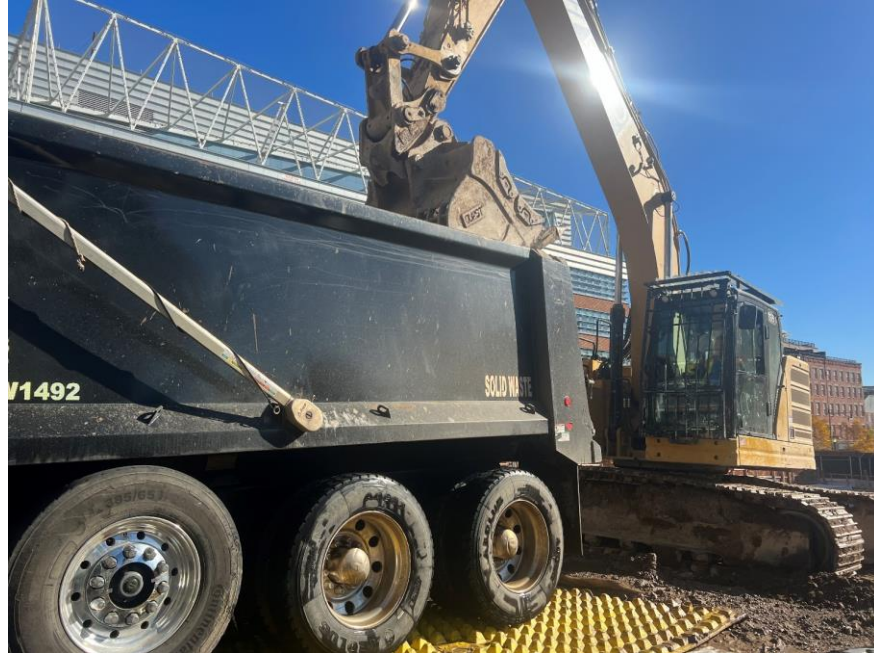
ECD loading a truck with non-hazardous soil/fill for off-site disposal (facing southeast)
